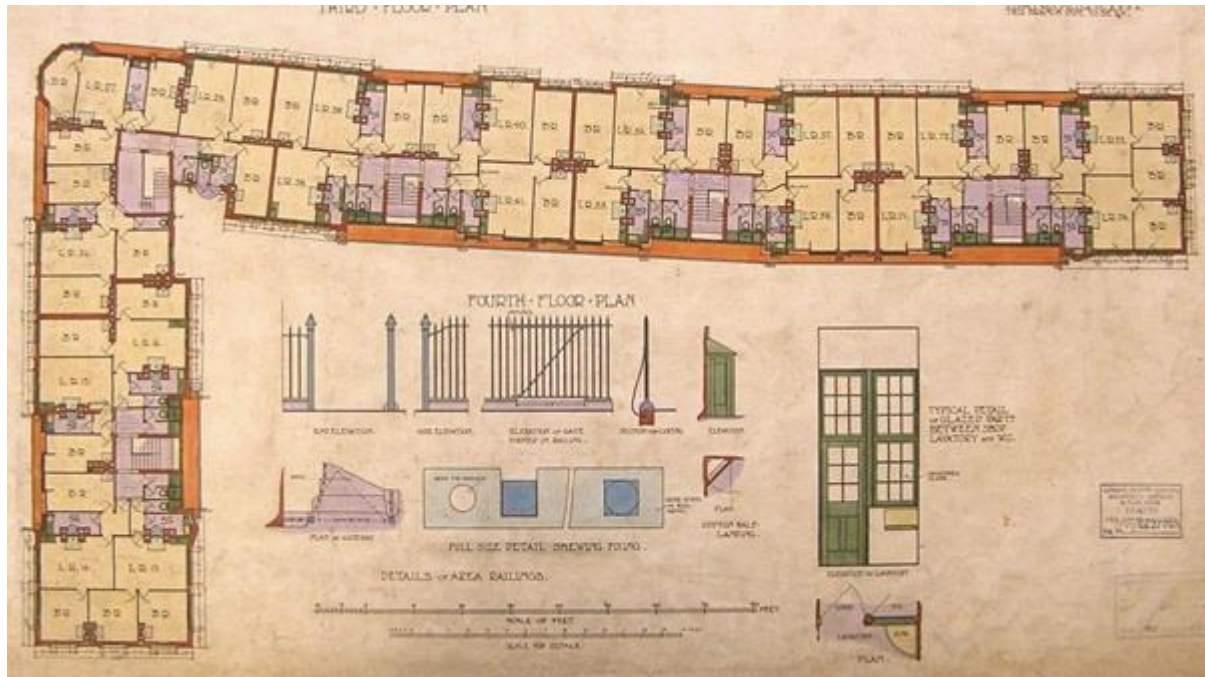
Third floor plan of larger Chadworth Building (LCC/AR/HS/03/014)
